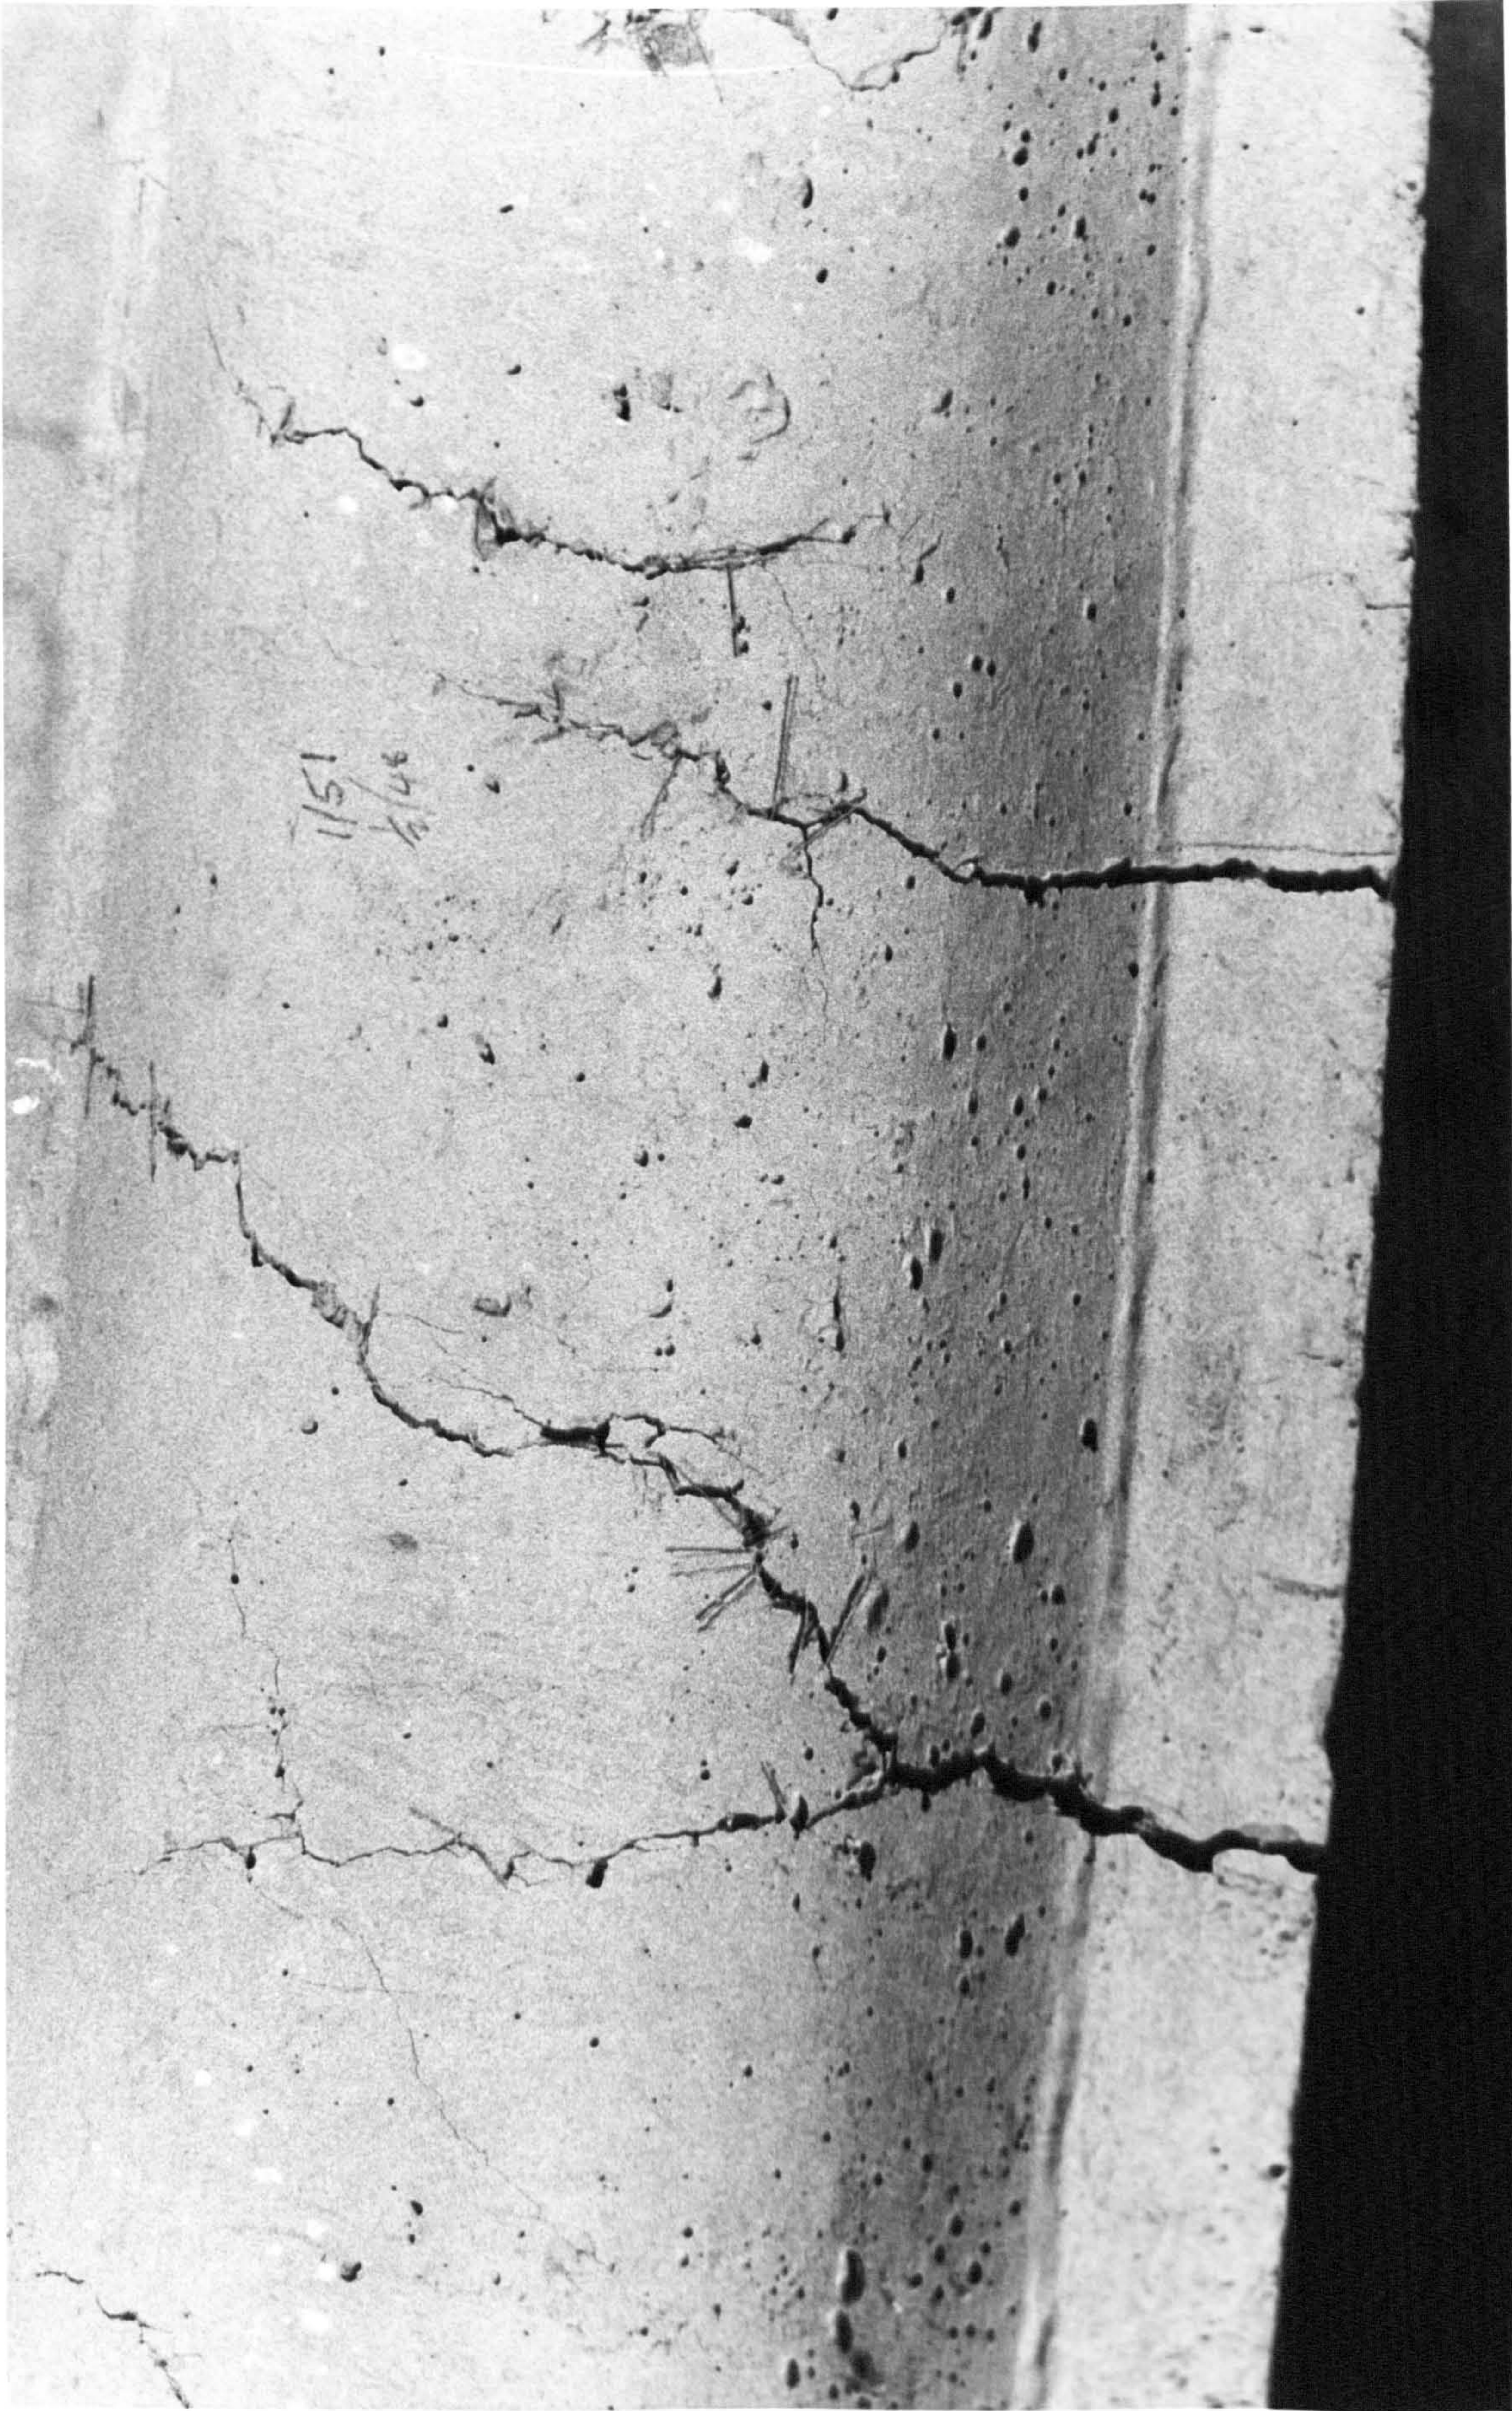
FIBRE "BRIDGES" ACROSS CRACKS
